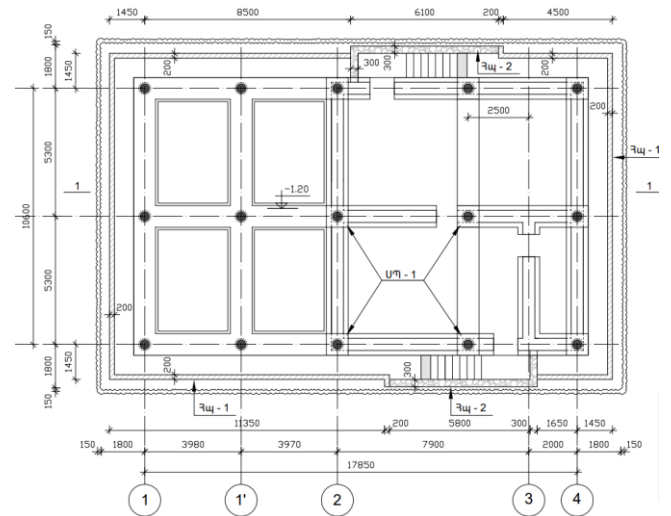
Plan of the 100 mm thick underlayer envisaged around the old building and under the foundation beams of the extension to be newly constructed.
